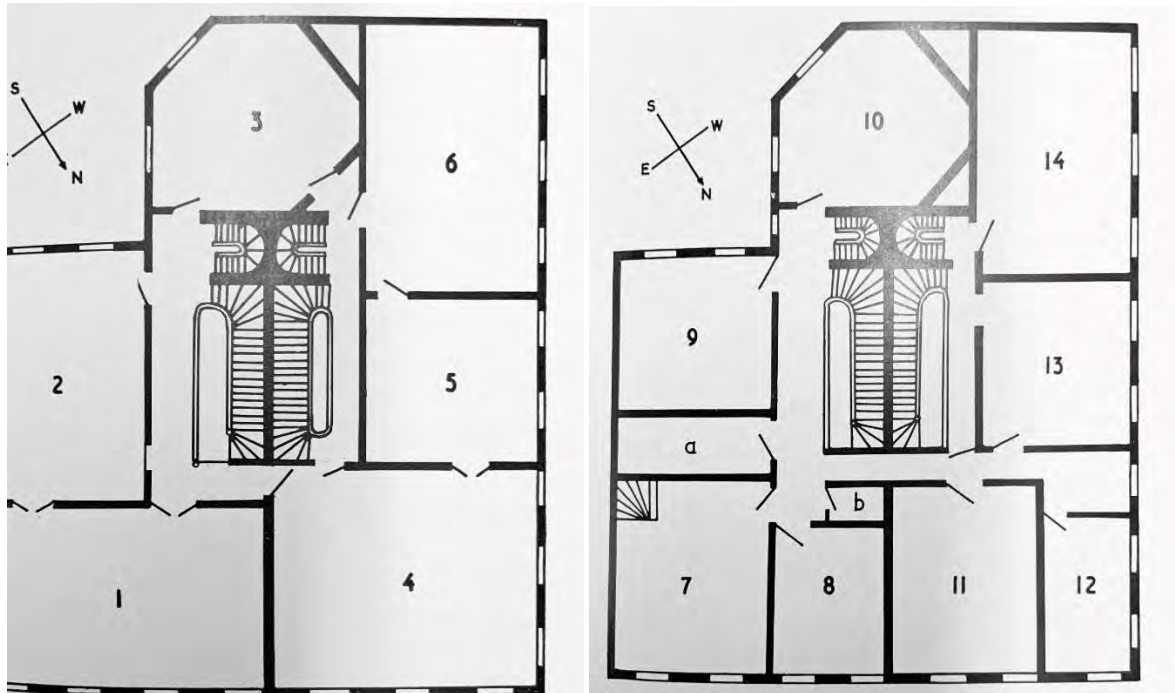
First floor plan (left) as arranged in 1863 and second floor plan (right) as arranged in 1903.
